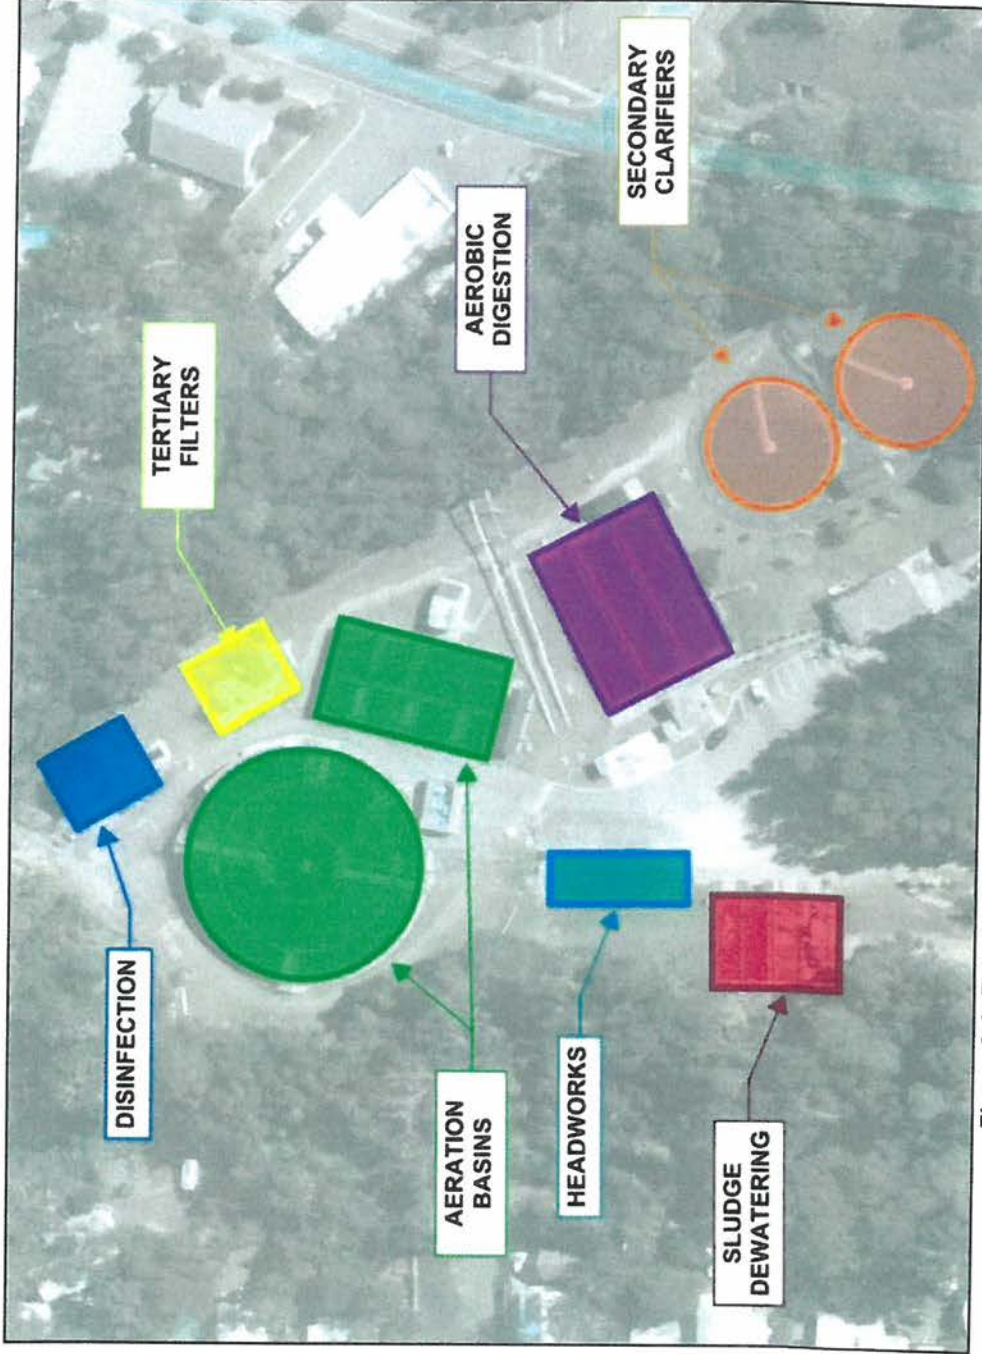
Existing WWTP General Site Plan and Major Unit Process Layout
